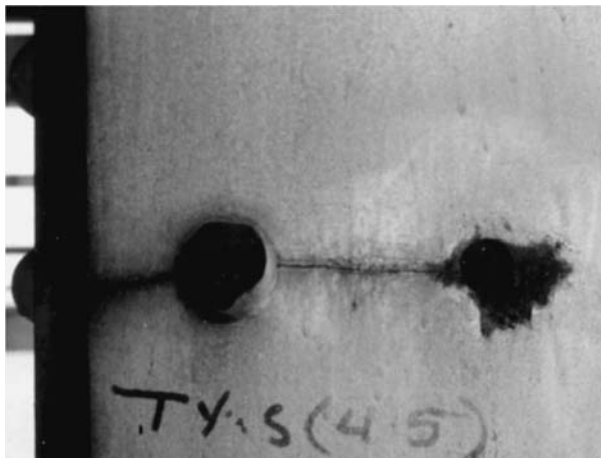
Close-up of fatigue crack from rivet hole with crack arrest hole.
